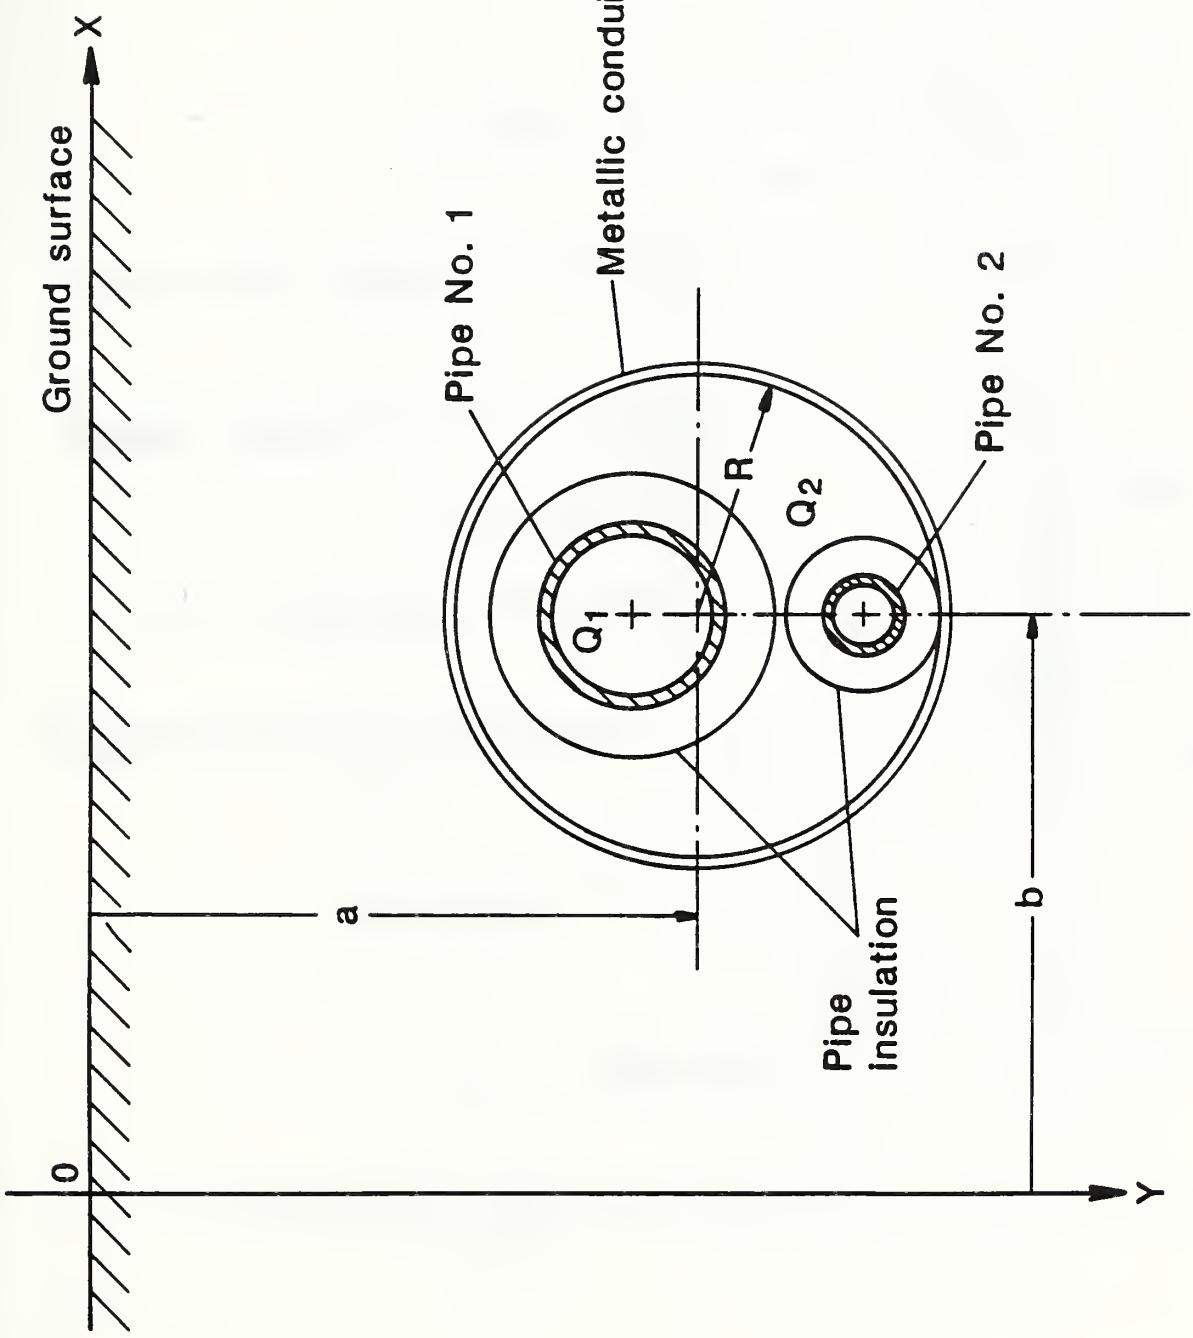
Two Underground Pipes Encased in a Metallic Conduit
